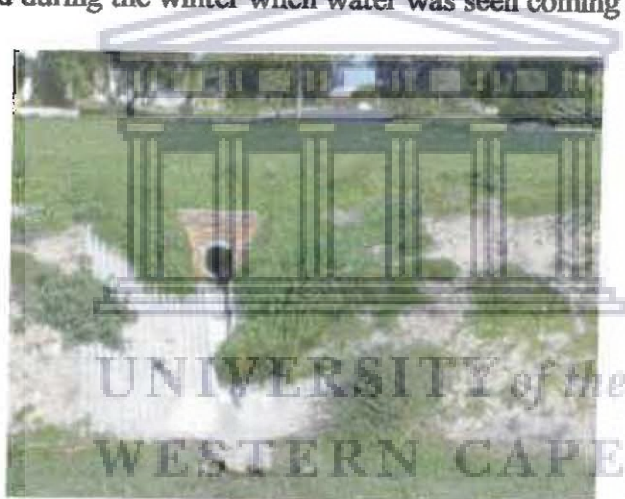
Storm water outlet pipe stabilised and reinforced with concrete after the October – November 2001 channelisation
